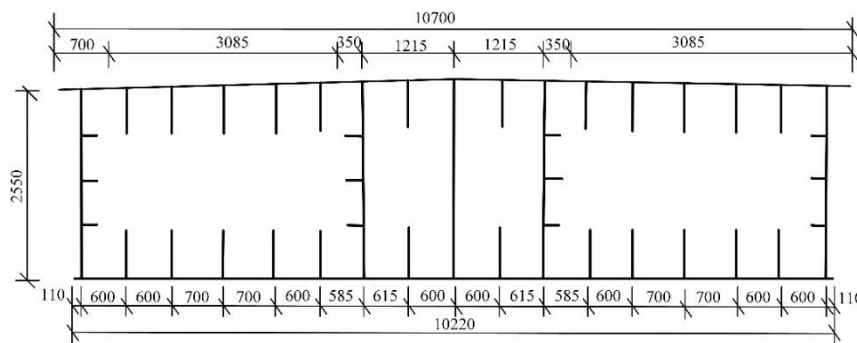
The bridge steel-concrete composite girder cross-sectional diagram (mm)
